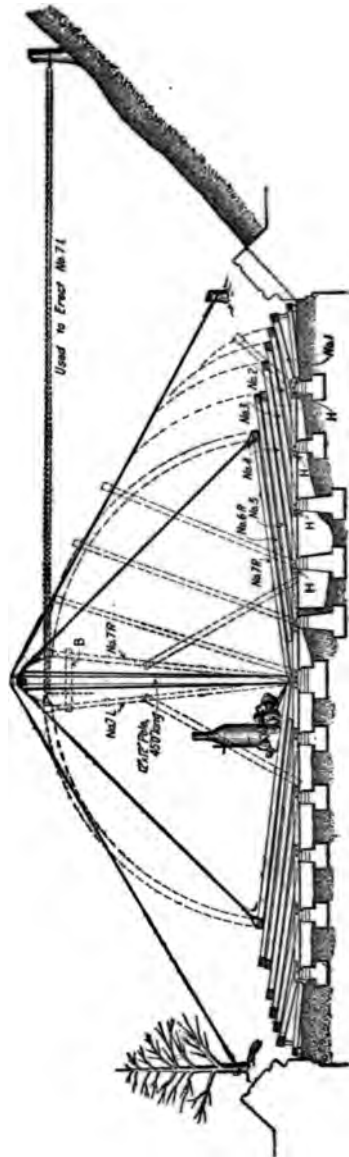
Method of Erecting Centers for Piney Creek Bridge.
